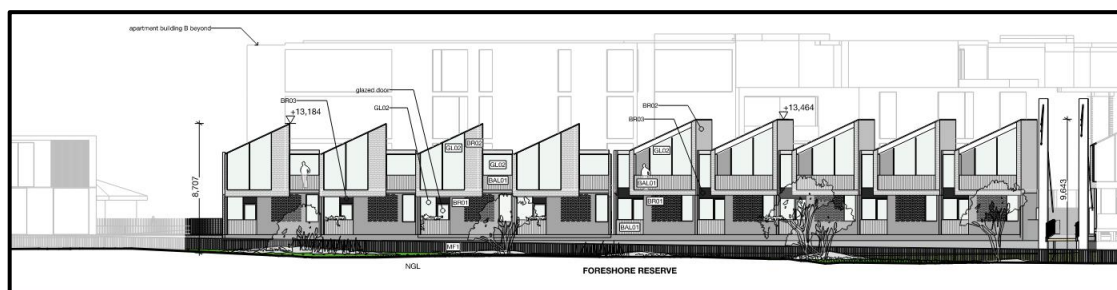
An elevation view looking toward the proposed Building E from the foreshore reserve, with the proposed café to the left of the field of view and proposed building B in the background.
